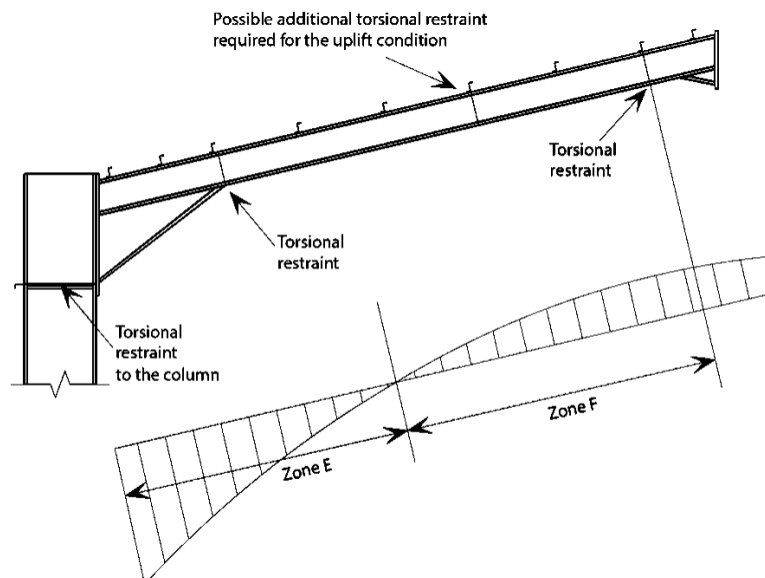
Typical restraints arrangements on a portal frame: uplift [118]
